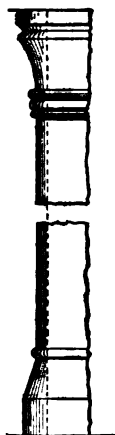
Cast-iron Column with Cap and Base. Slight Projections
